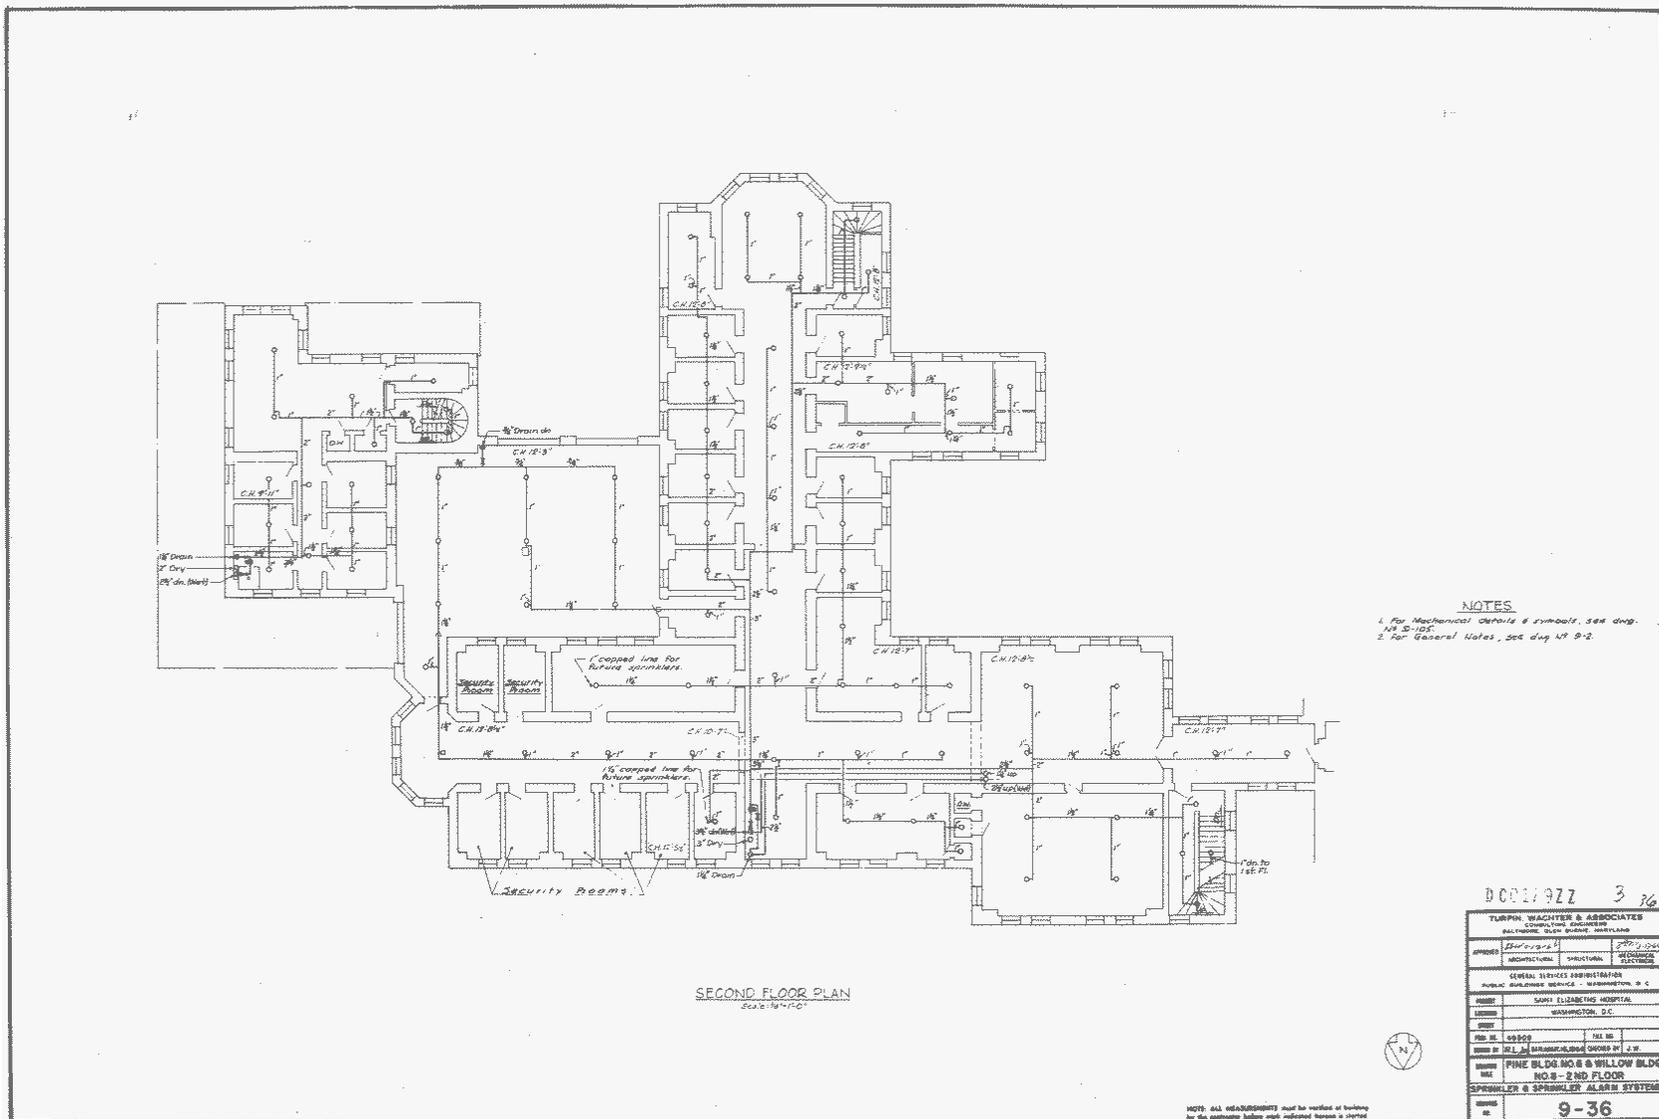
Second floor plan of Pine showing fire suppression system improvements, 1964. Source: GSA Archives, image DC0179SE0003.
